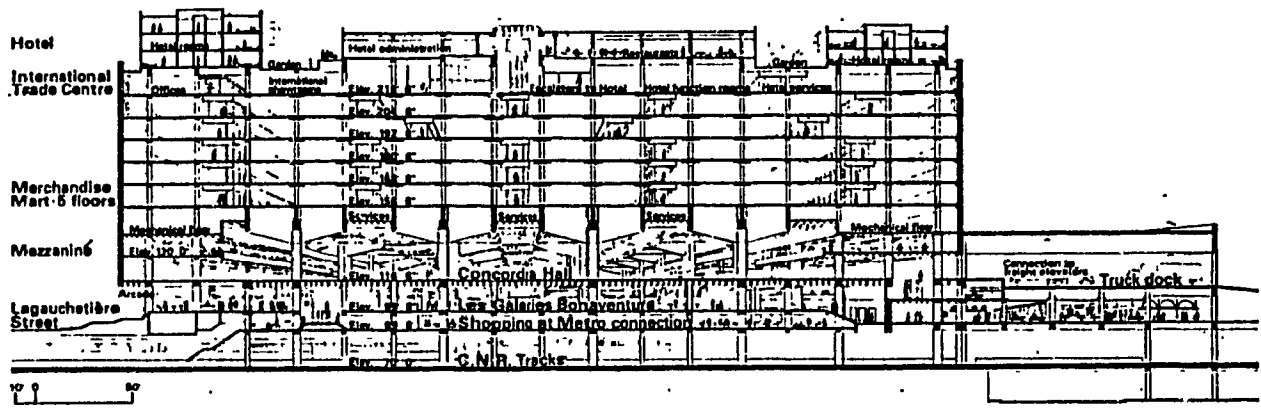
ARCOP, Place Bonaventure, Section Looking East, 1966.
